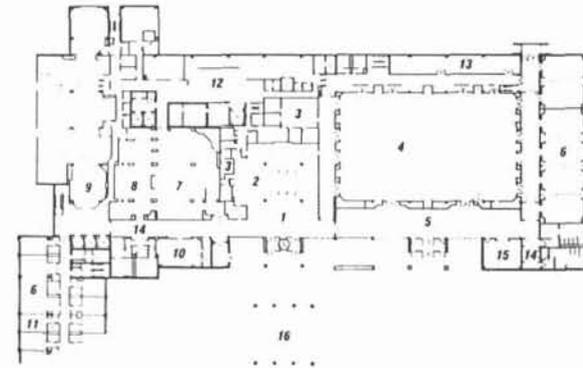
Burlington Marriott, WZMH Group, Burlington - MA.
